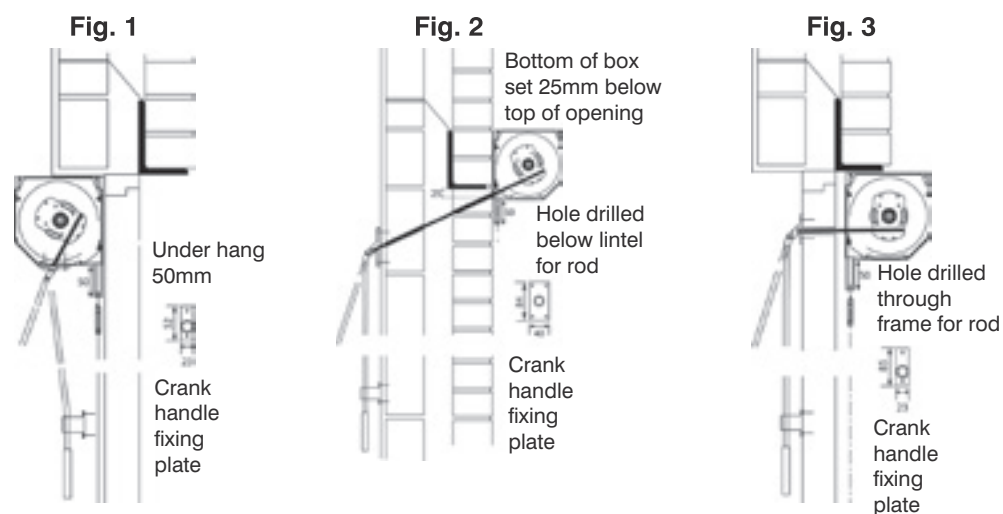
is a 45° joint with 2 hole fixing plate, box exit F
